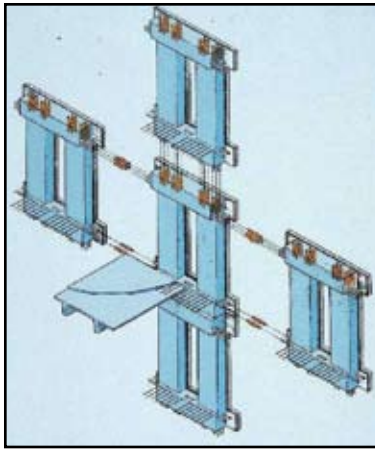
The 22-story building at 100 Washington Square in Minneapolis, Minnesota. Precast panels were joined horizontally and vertically to form Vierendeel wall trusses.
